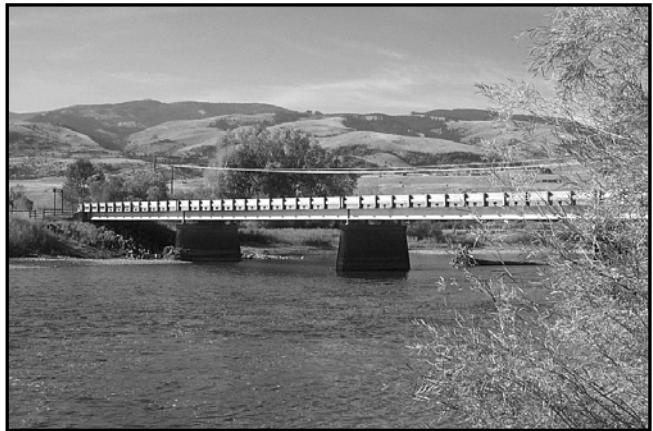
Emigrant Bridge. Photo by E. Galli-Noble.
